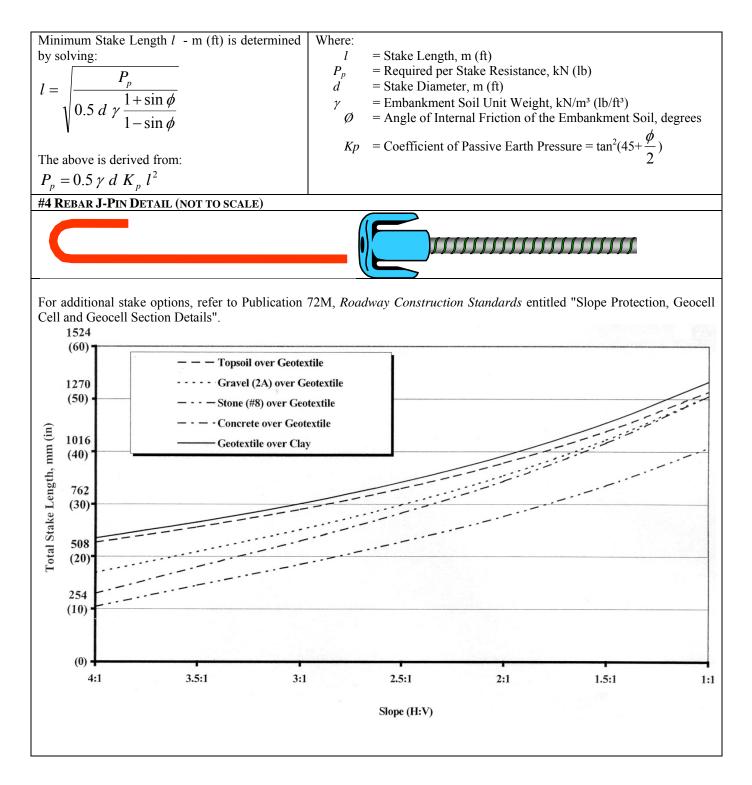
Required Stake Length for #4 Rebar Typical Roadway Soil Embankment
